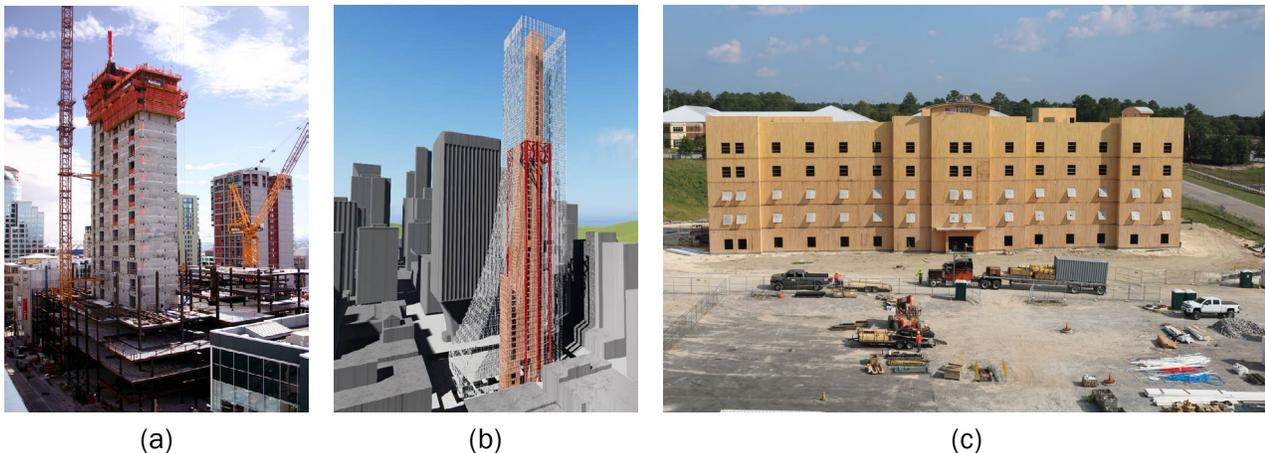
The Three New Seismic Force-Resisting Systems that Are Introduced and Approved in the 2020 *NEHRP Recommended Seismic Provisions*: (1) reinforced concrete ductile coupled walls (Source: MKA), (2) steel and concrete coupled composite plate shear walls (Source: MKA), and (3) cross-laminated timber shear walls (Source: Lendlease).
